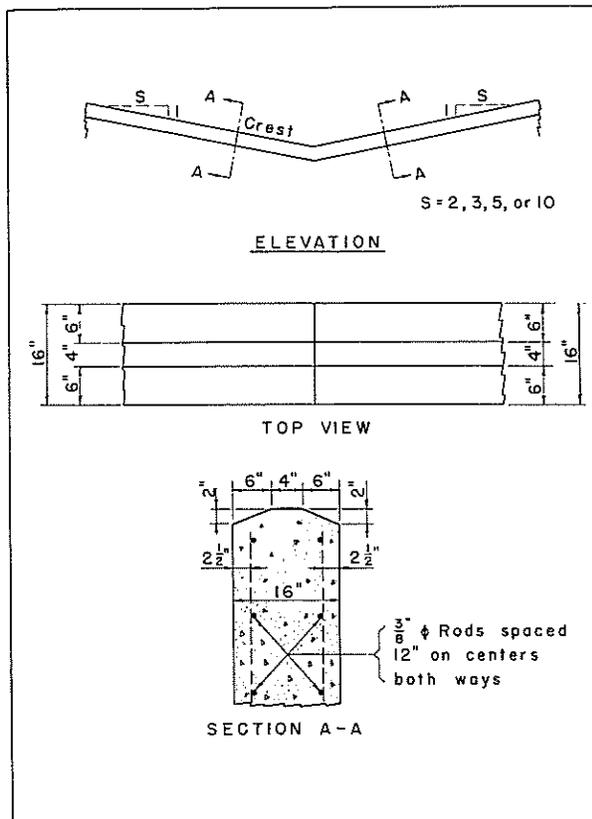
Shape of a standard cross section of a triangular weir with a 16-inch (40.6 cm) crest.
